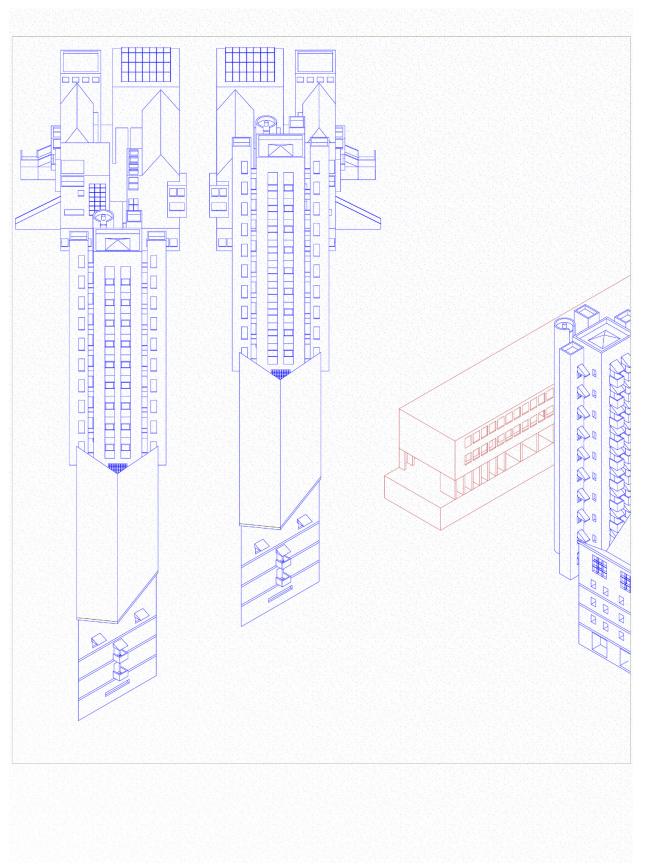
Plan for Megastructure Set of 2 3'x8' drawings at 1"=75'
